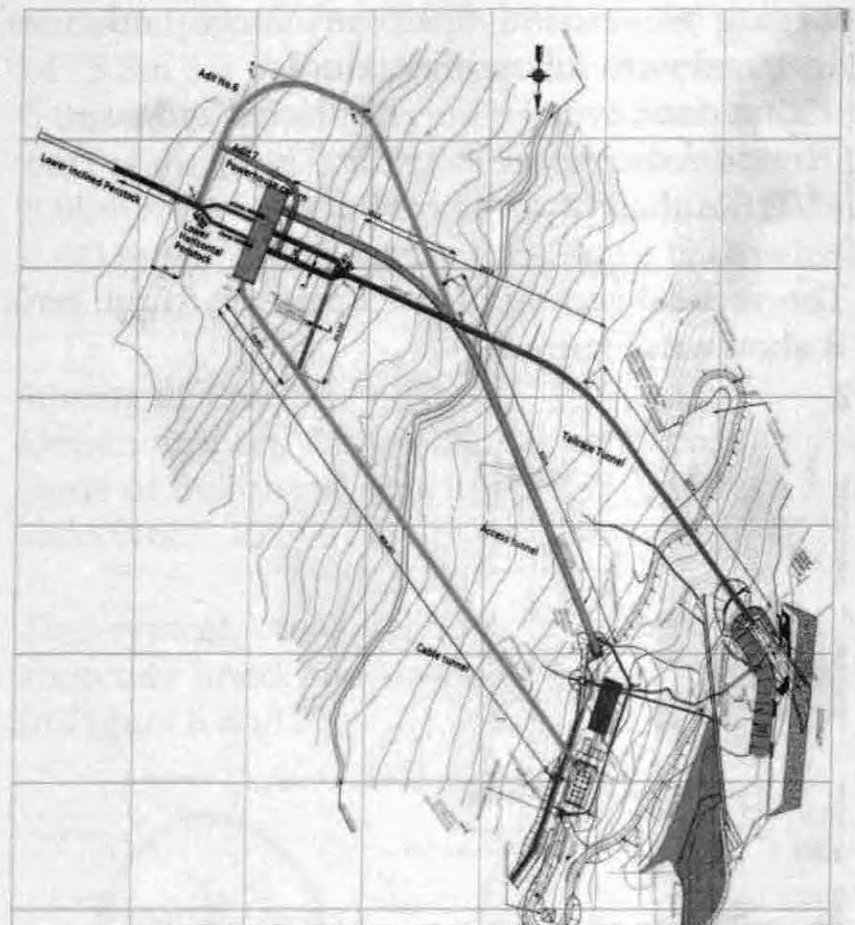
Layout of Powerhouse Complex and Outdoor Switchyard
